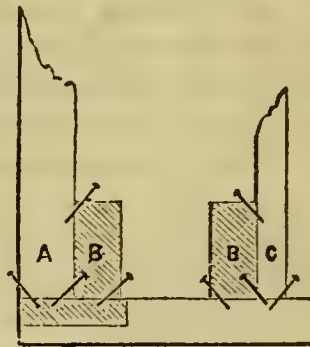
ELEVATION SECTION—manner of nailing.—A. corner stud, 4 by 4—B. joist, 5 by 3—C. 2 by 4.
